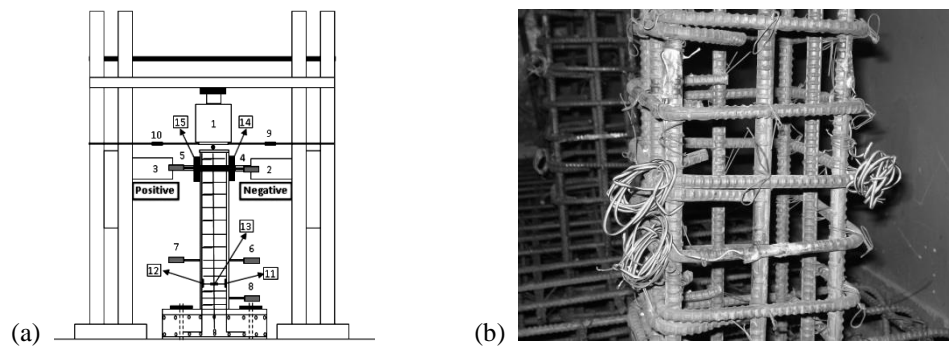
(a) Line diagram of test setup indicating instrumentation installed to record response of column specimen
